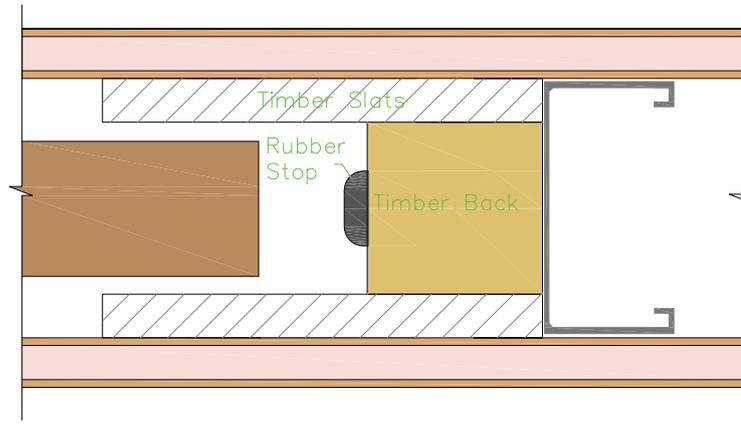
E | Metinno Aluminium Cavity Jamb Detail
